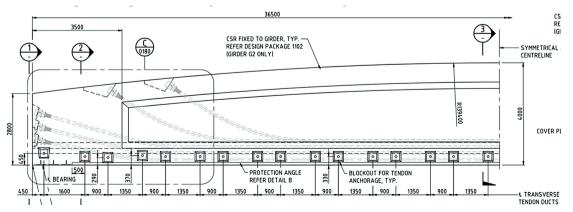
Main girder half elevation, showing longitudinal PT profiles and transverse PT anchorages
